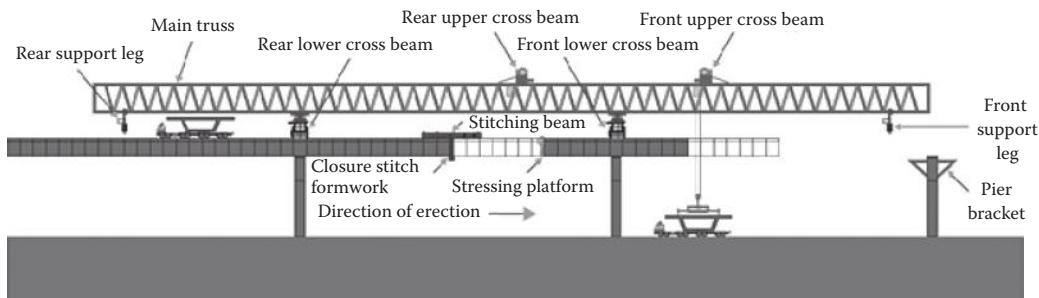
Example of balanced cantilever erection with launching gantry. (From VSL. *Bridge Construction Partner*, VSL International, Köniz, Switzerland, 2013.)
